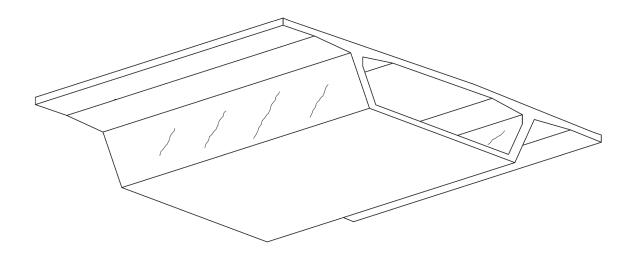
Superstructure Potential Crack Pattern for Pure Shear
